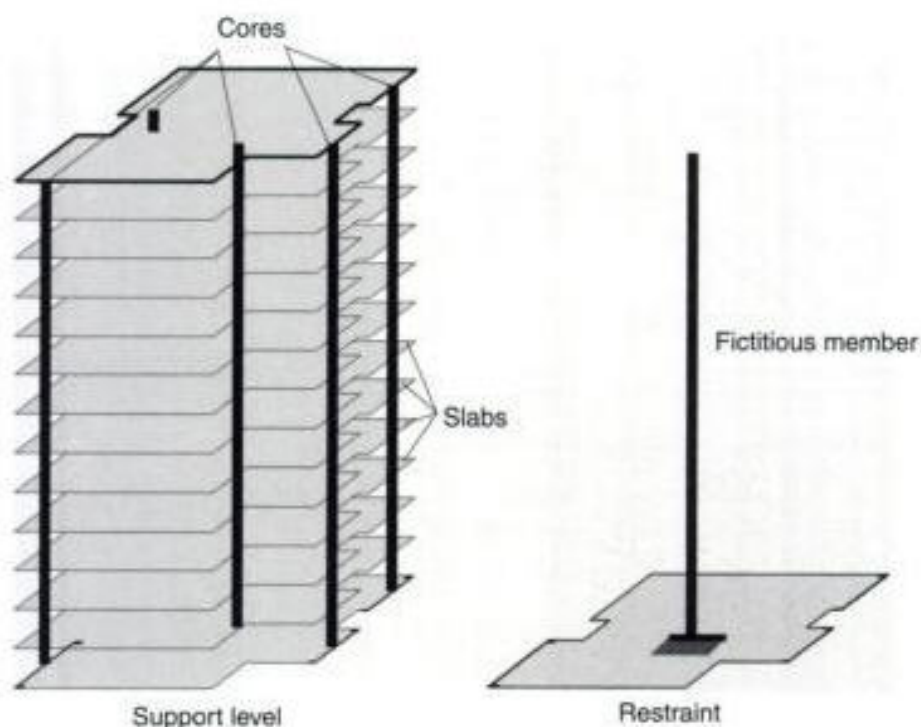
Modelling of a bracing system – fictitious bar method
